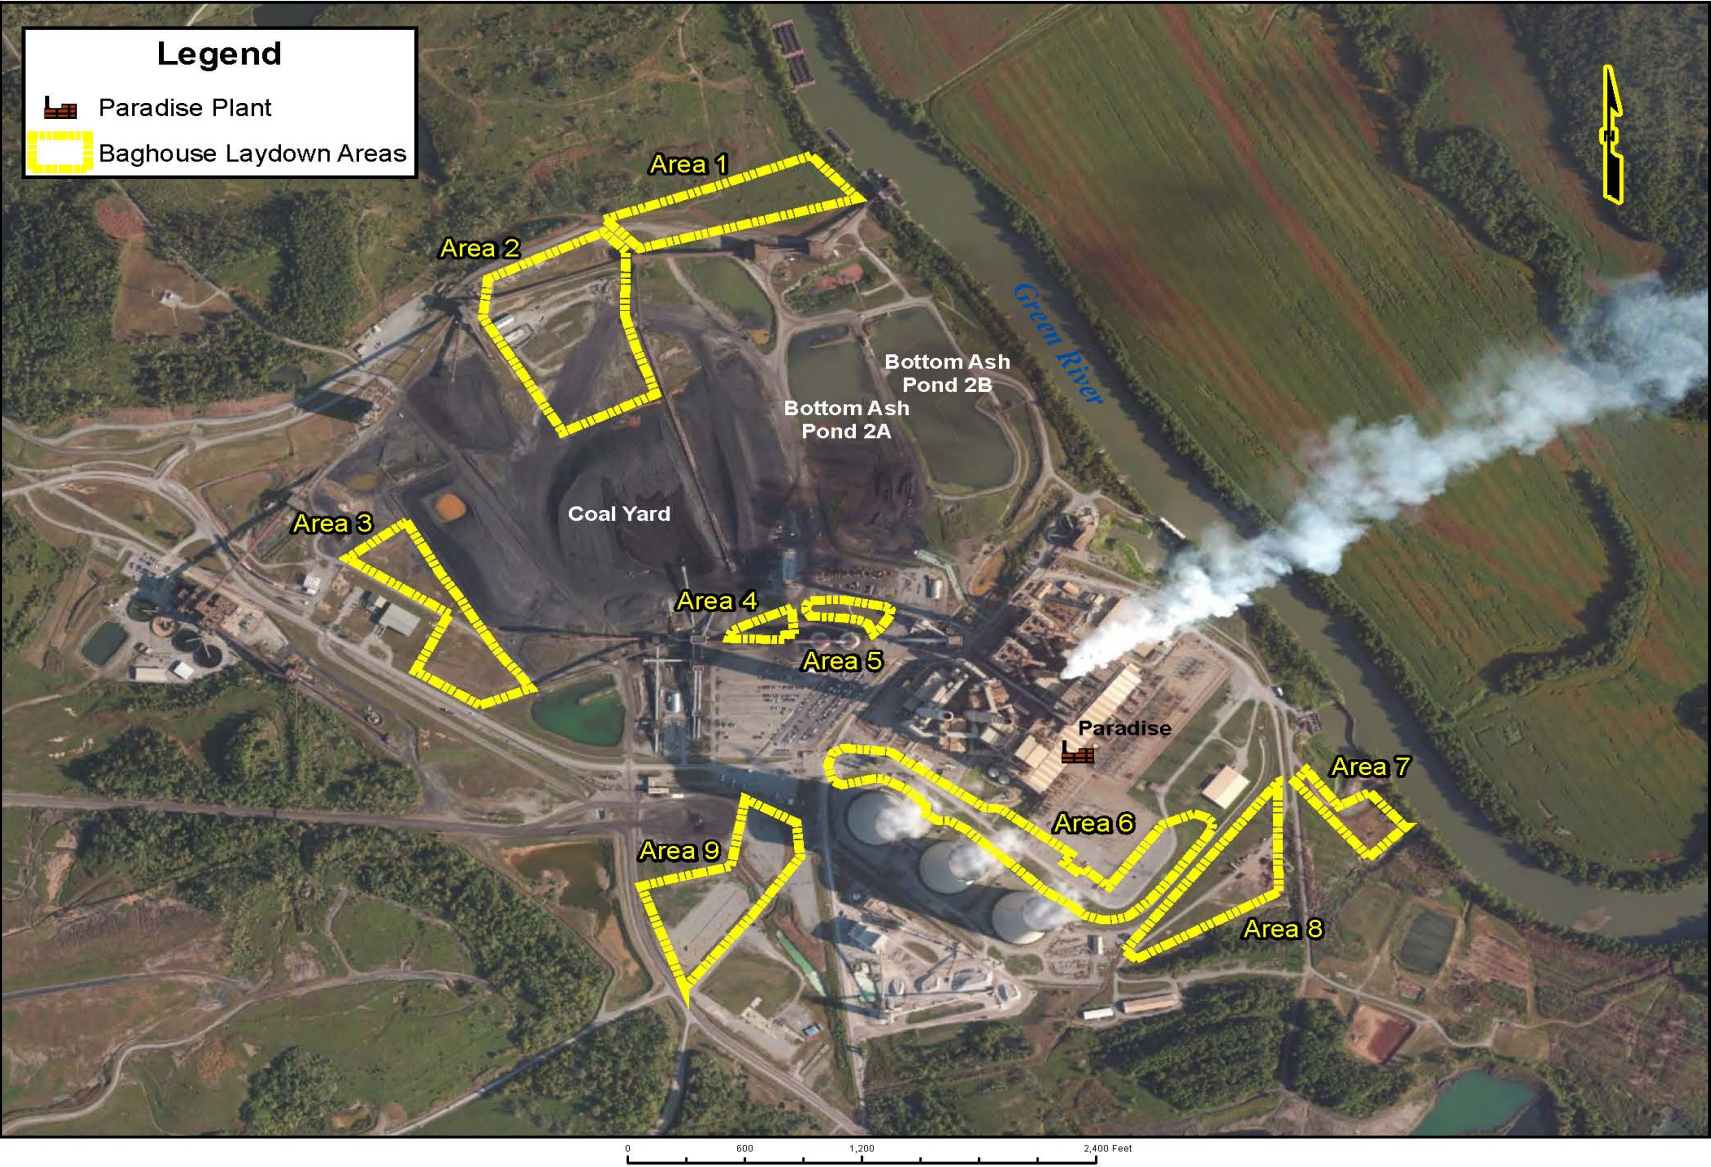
Construction Laydown Areas for Proposed PJFF Equipment
